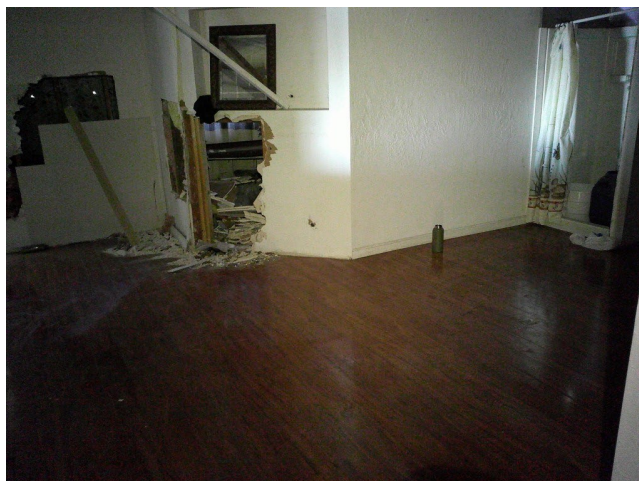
1326 West Fremont Street building woodgrain laminate flooring.
